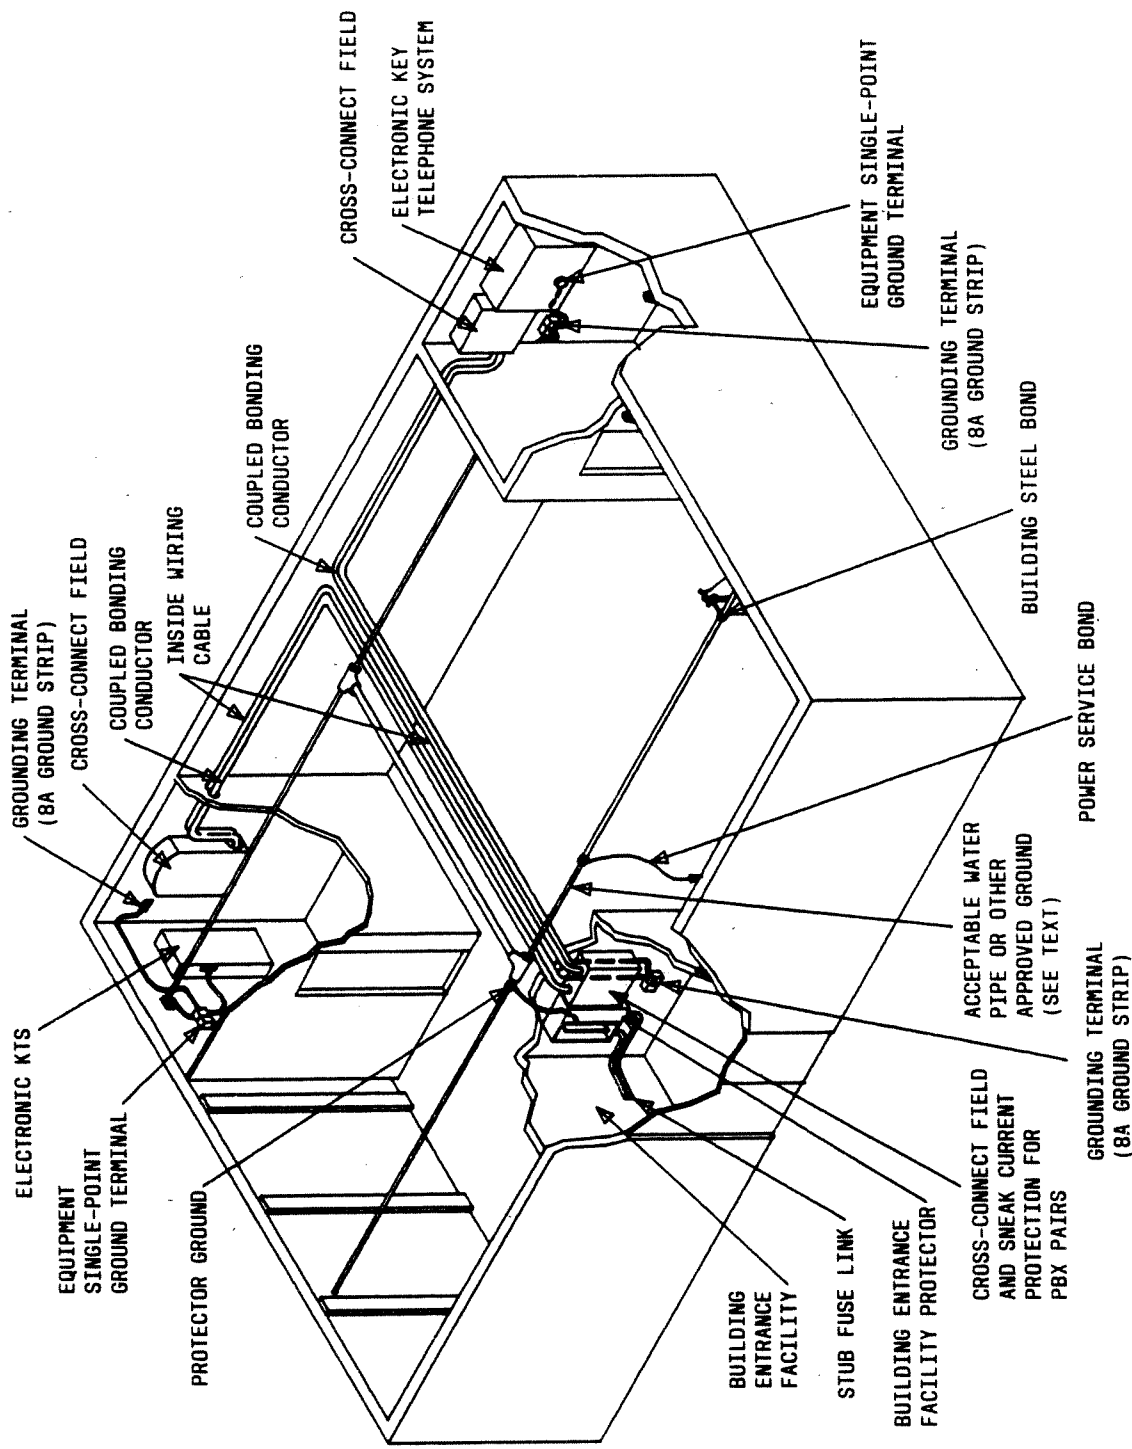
Equipment Bonding—Typical Low-Wide Building
